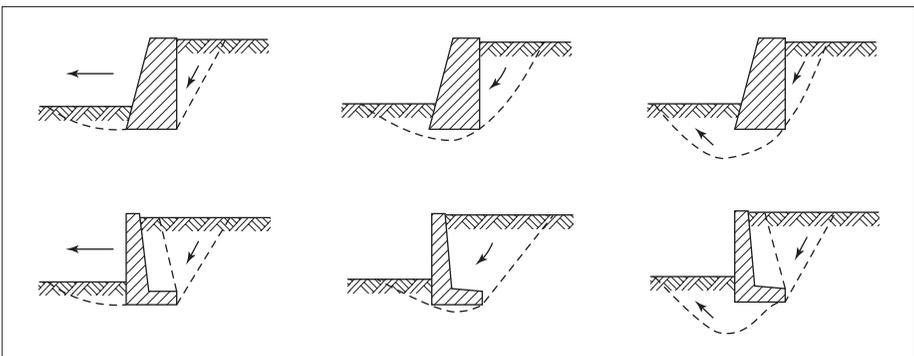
Examples of limit modes for foundation failure of gravity walls (after Section 9.7.3 EC7 Part 1)
